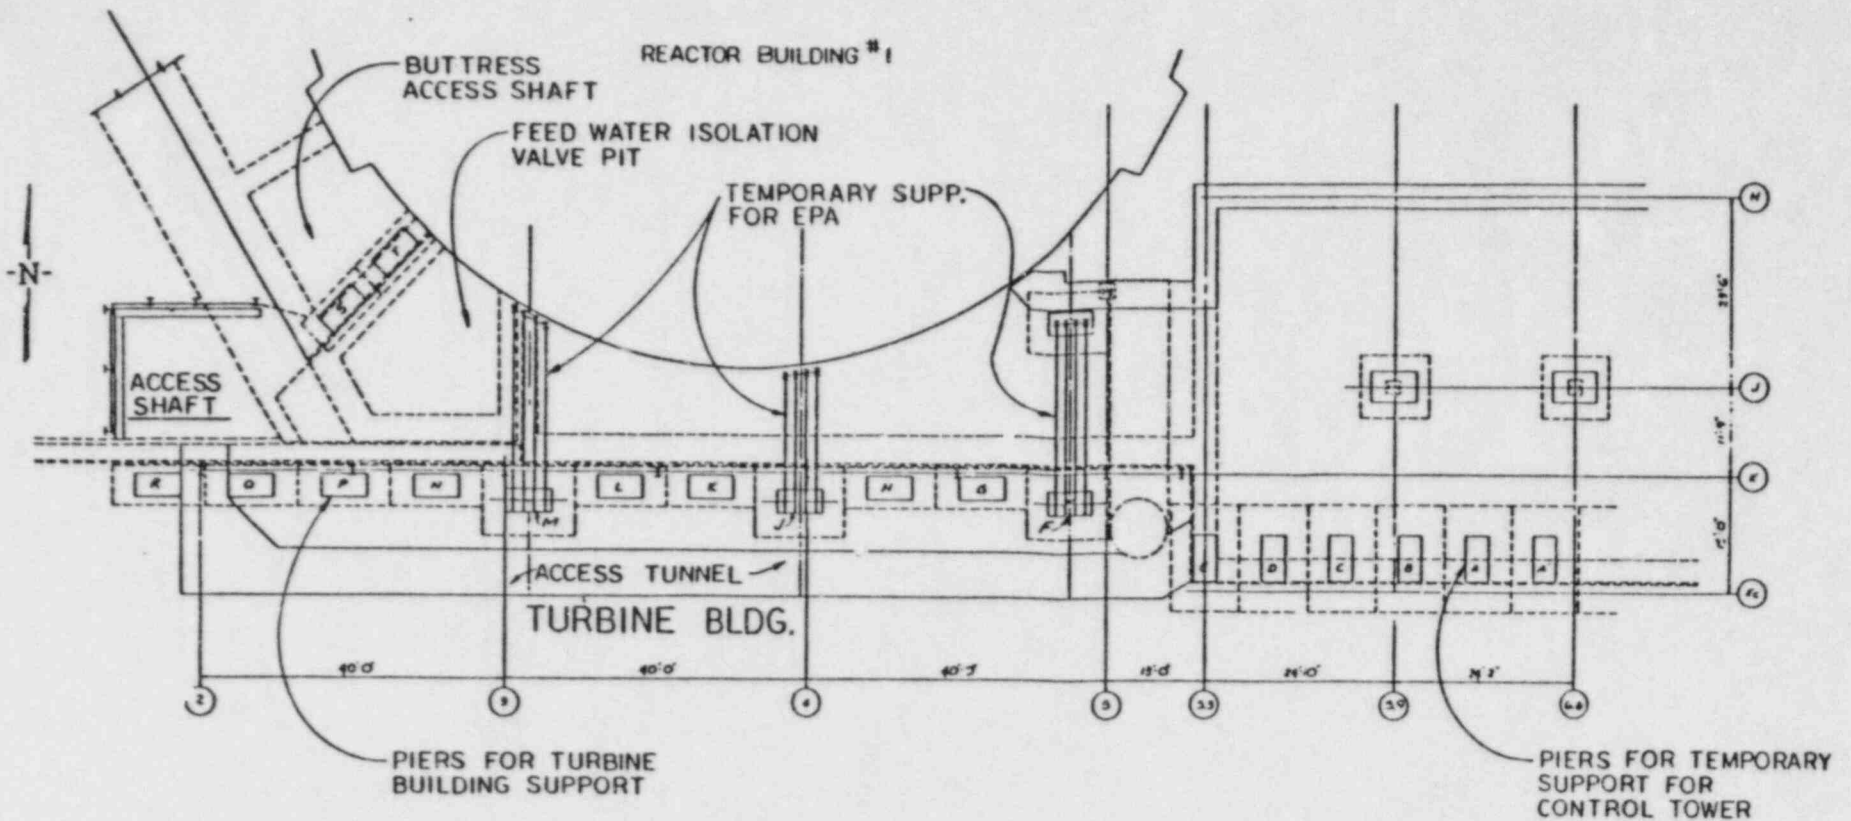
UNDERPINNING CONSTRUCTION SEQUENCE PLAN
